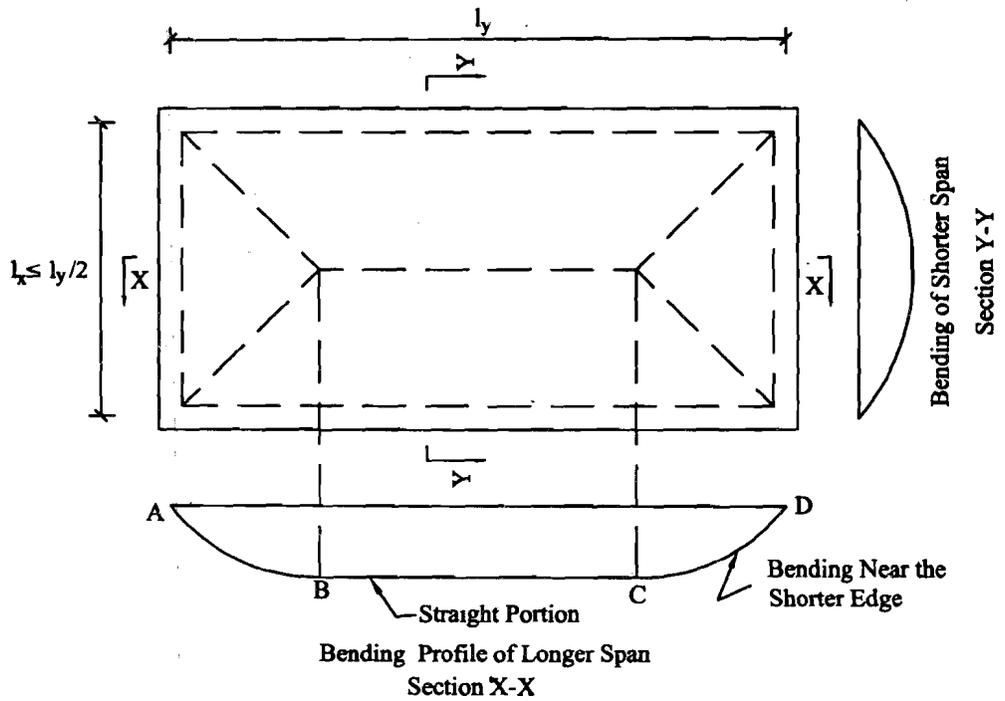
Bending Profile of an One Way Slab Supported on all Edges
